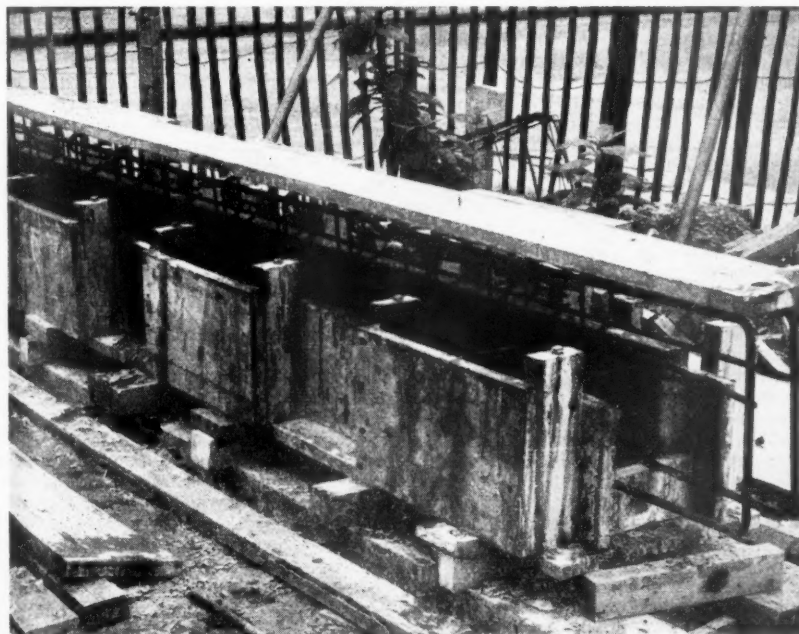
Mould for precasting beams on the Picton Street site. John Laing & Son, Ltd.
